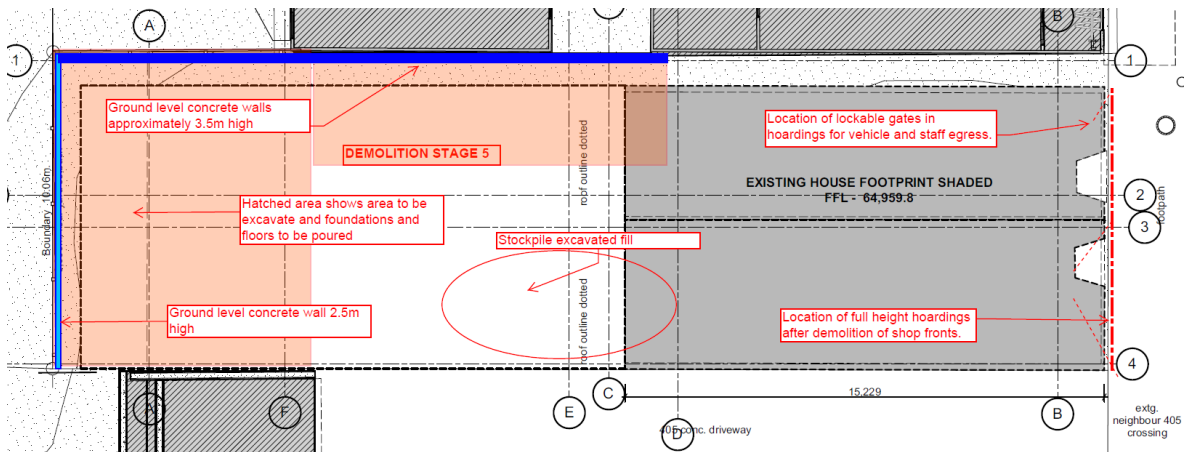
demolition of the rear portion of site, Dincell wall and foundation floor
